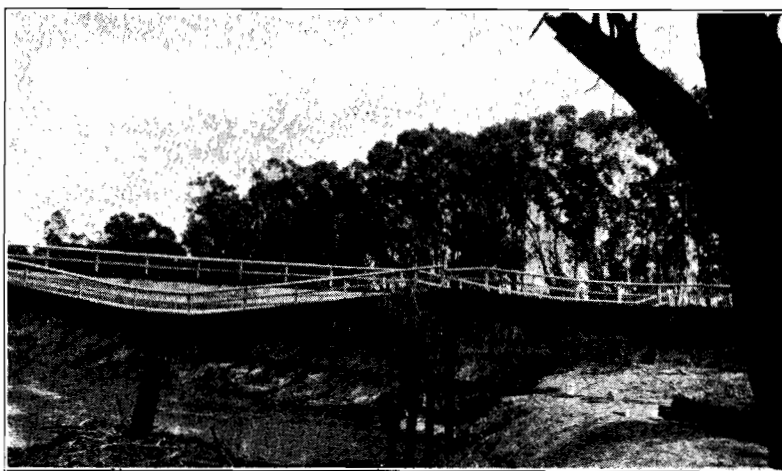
Showing collapsed portion of Stewart's Bridge on the Echuca-Picola Road in the Shire of Deakin.
